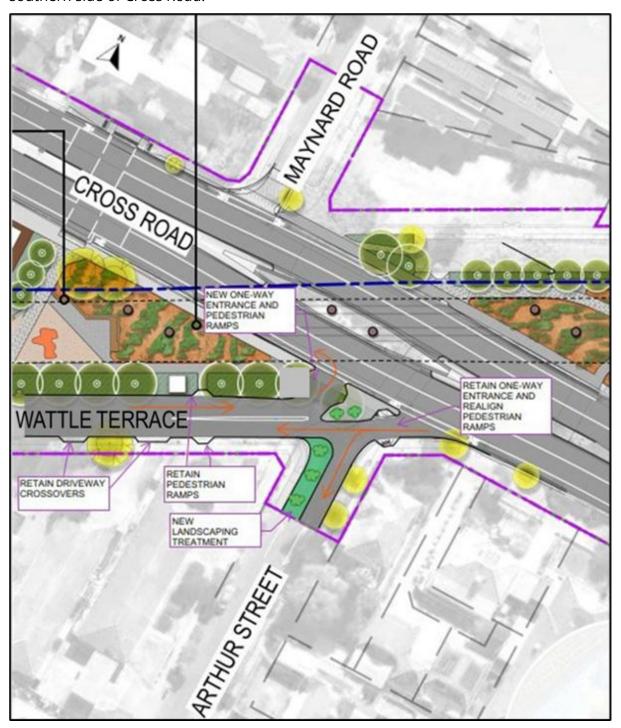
Potential Traffic Solution at the Wattle Terrace/Cross Road Intersection
